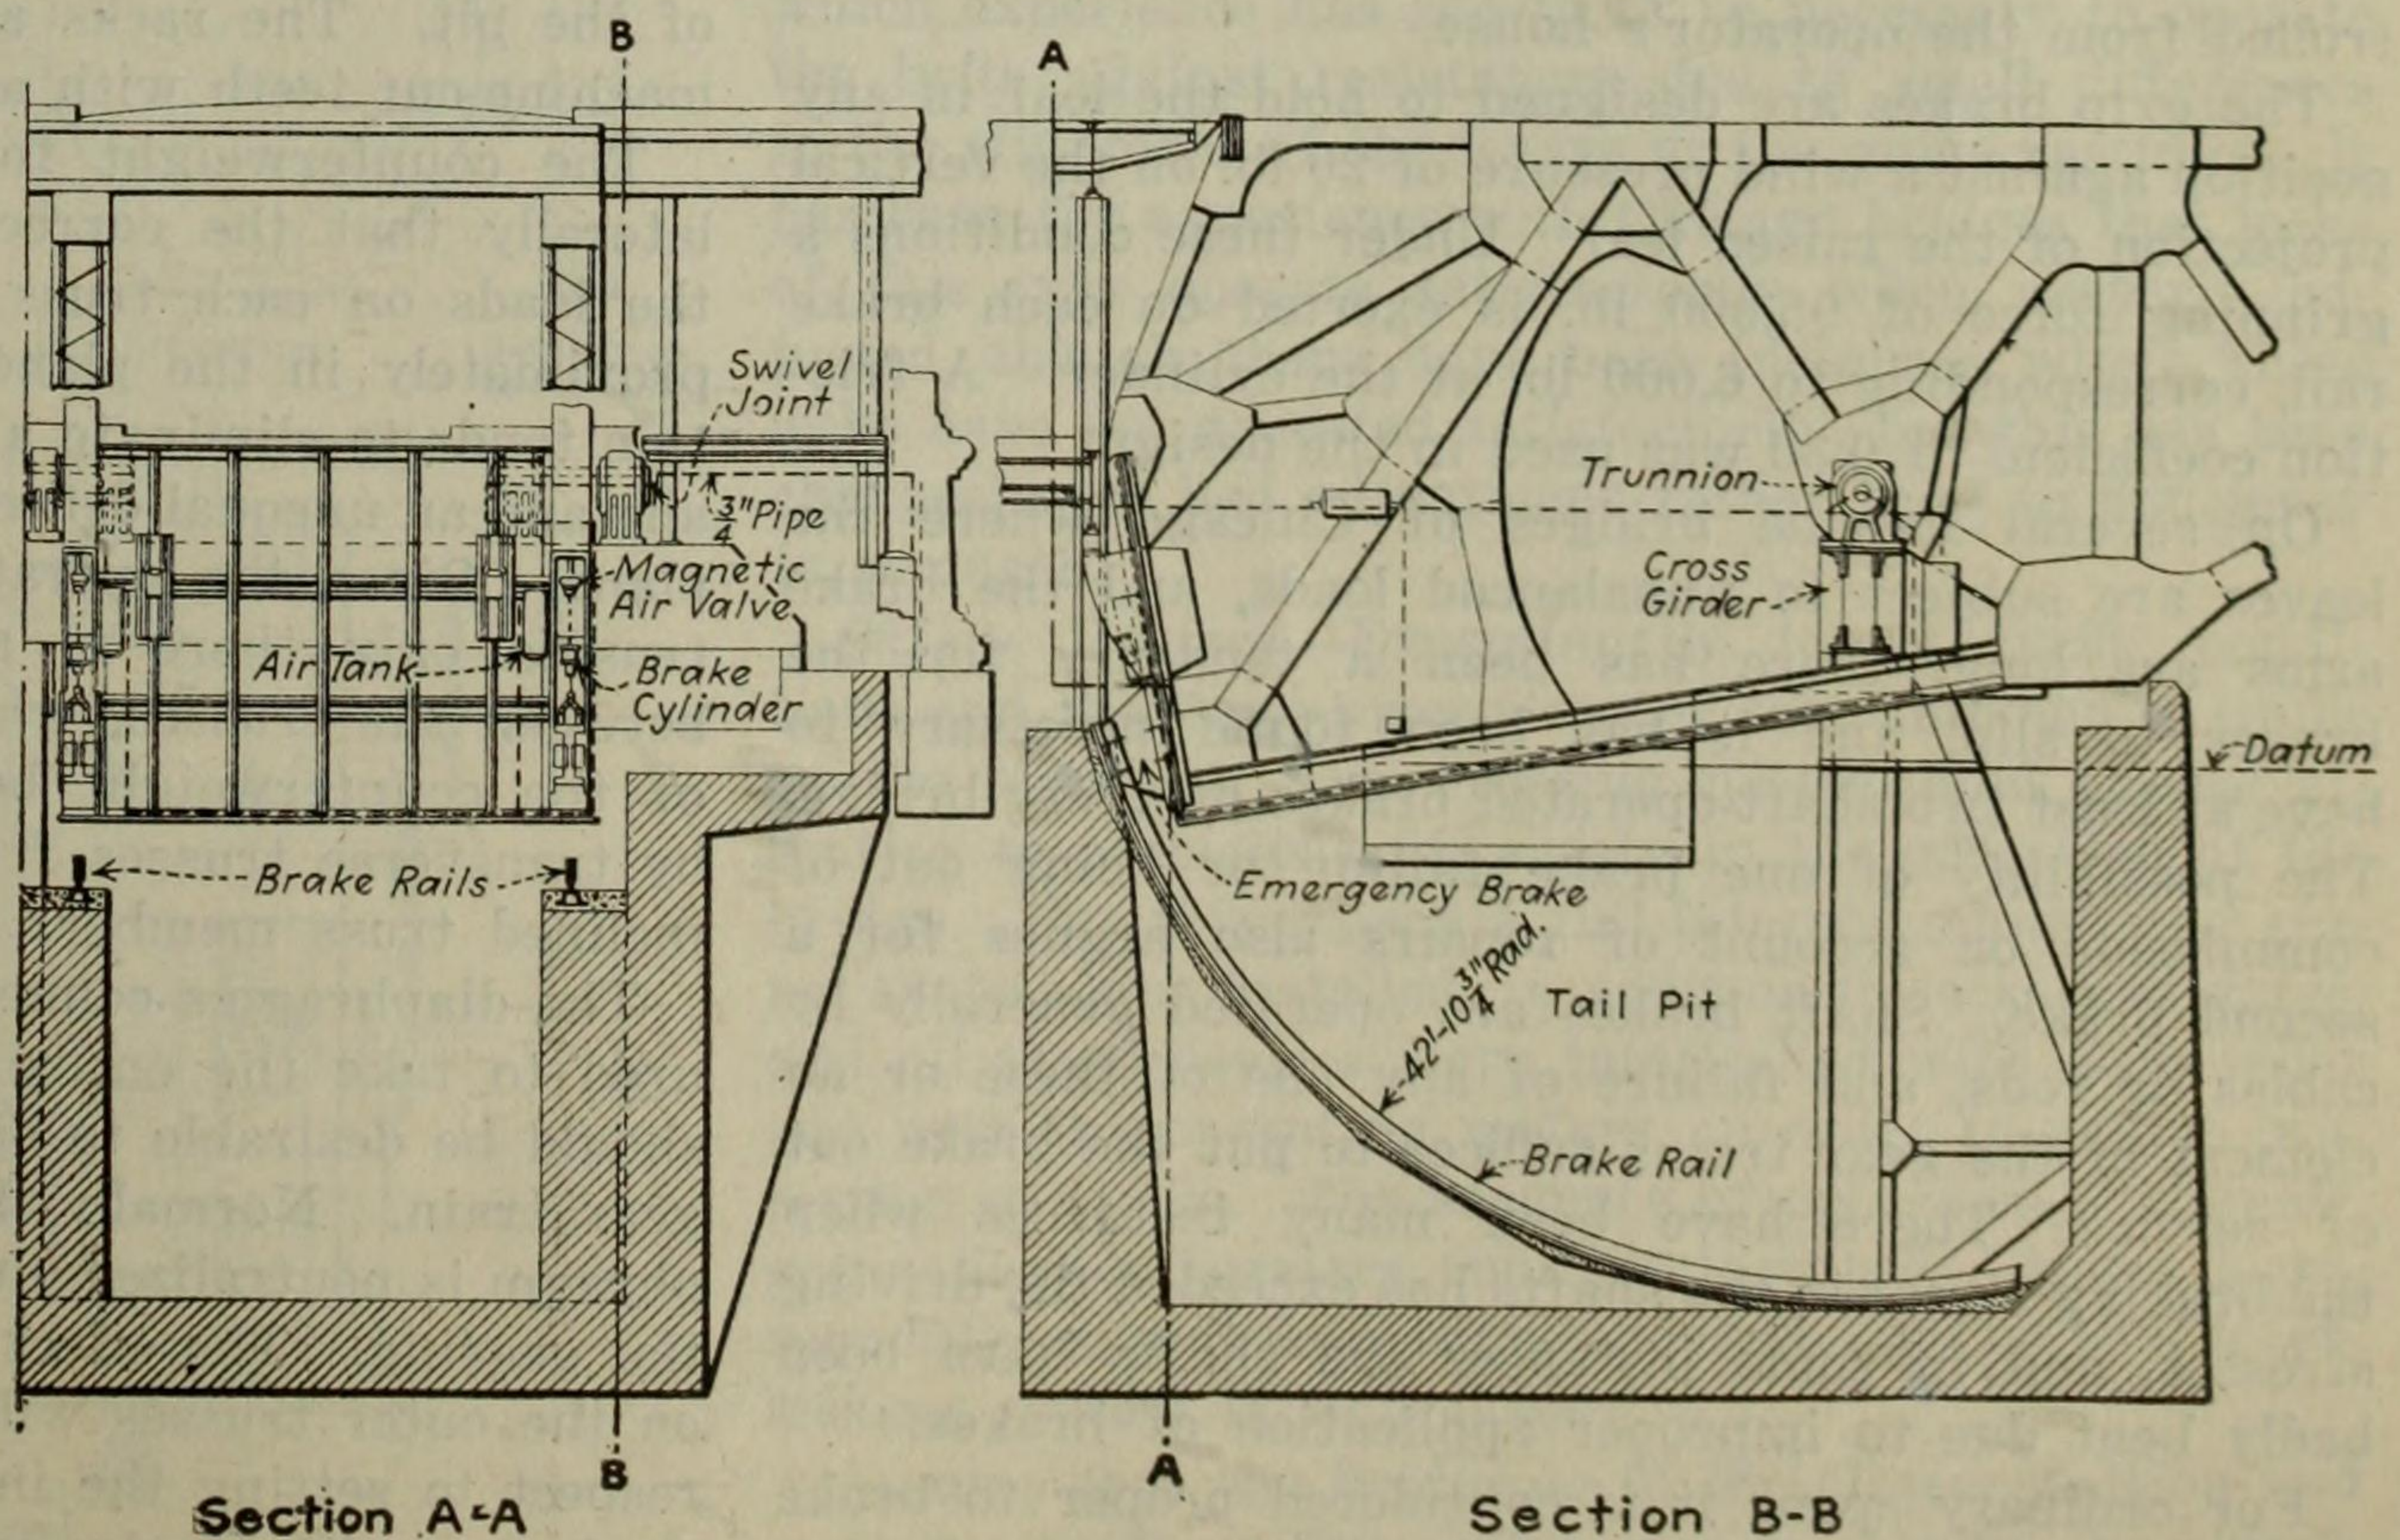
EMERGENCY GRIP BRAKE ON HEEL OF BASCULE
